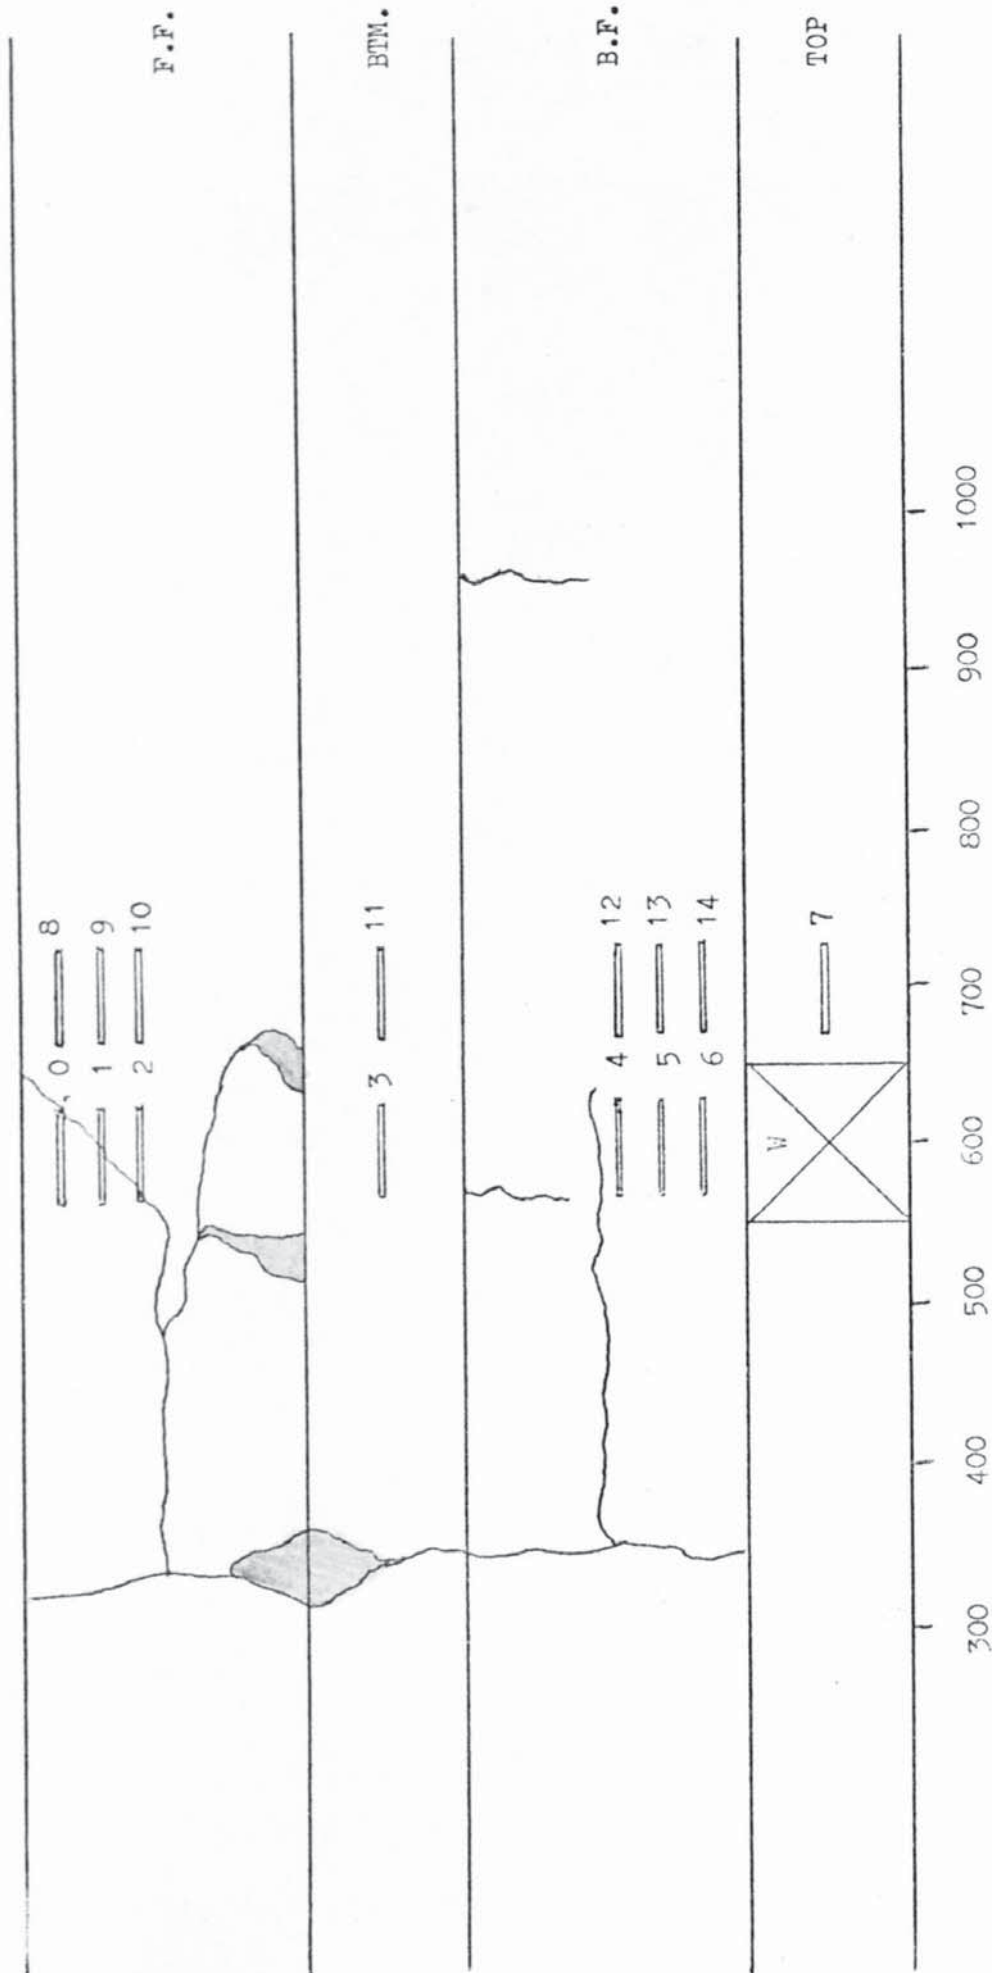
FAILURE CRACK PATTERNS - BEAM 28 ( MODE 1 )
